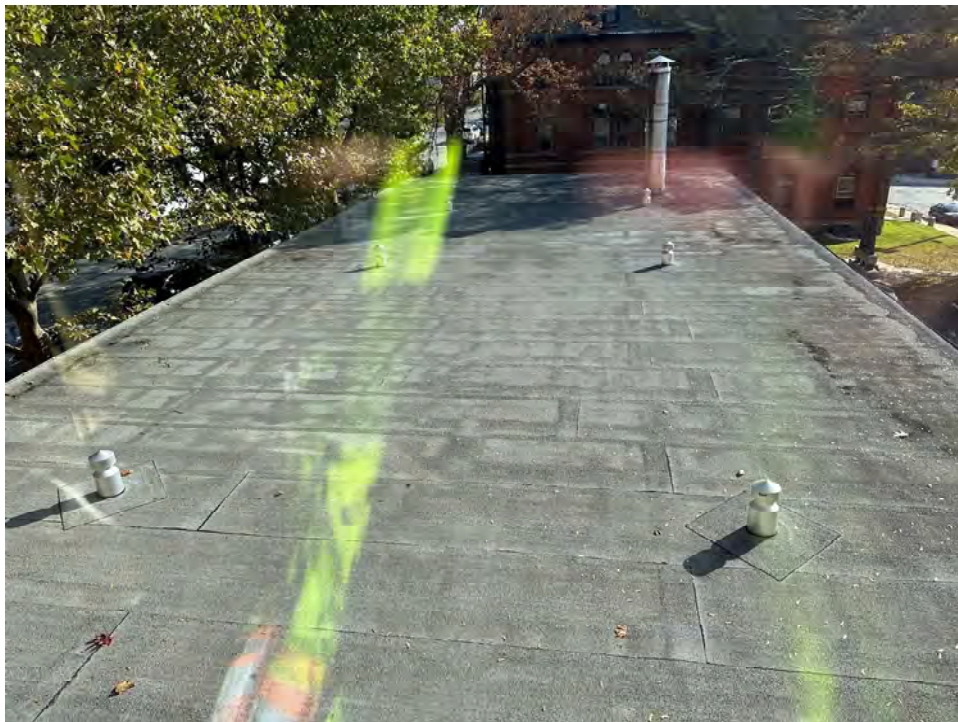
Overview of roofing membrane as visible from inside Old Fire Hall building
